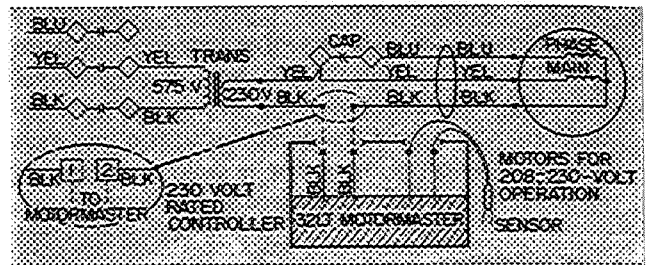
Power Wiring for 575-Volt Units Using 208-230-Volt Motors
